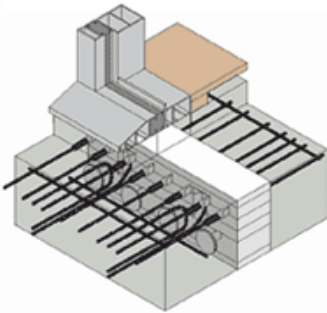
Detail of wall/floor junction, a typical point for thermal bridging
